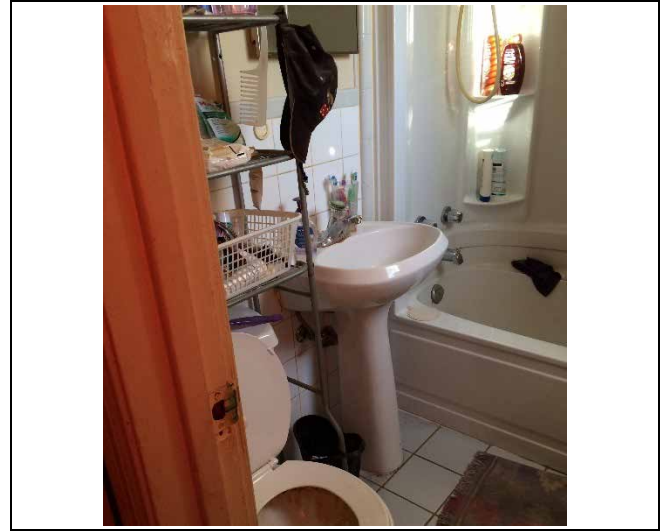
Presumed asbestos-containing ceramic tile grout and mortar / adhesive in the washroom wall and floor at 83 Brighton.
